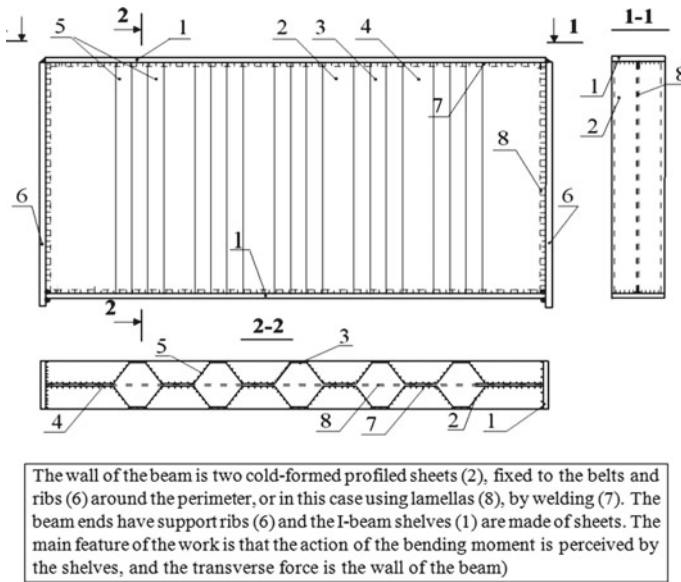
Steel beam with a cross-profiled box-section wall with uneven pitch of corrugations [9]
